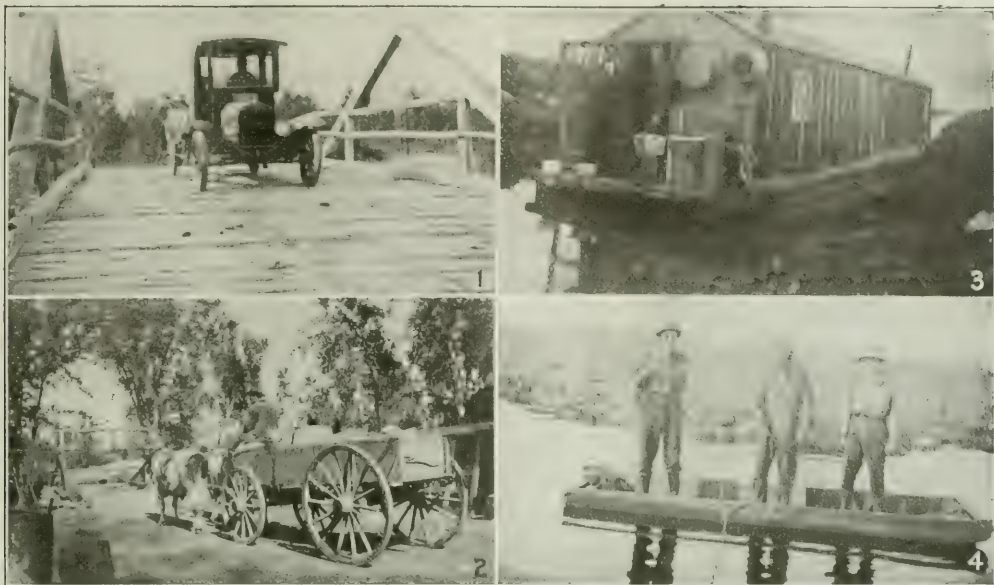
FLAT BOATS, OX TEAMS AND MOTOR TRUCKS TAKE SUPPLIES TO DREDGE CREW CAMPS
